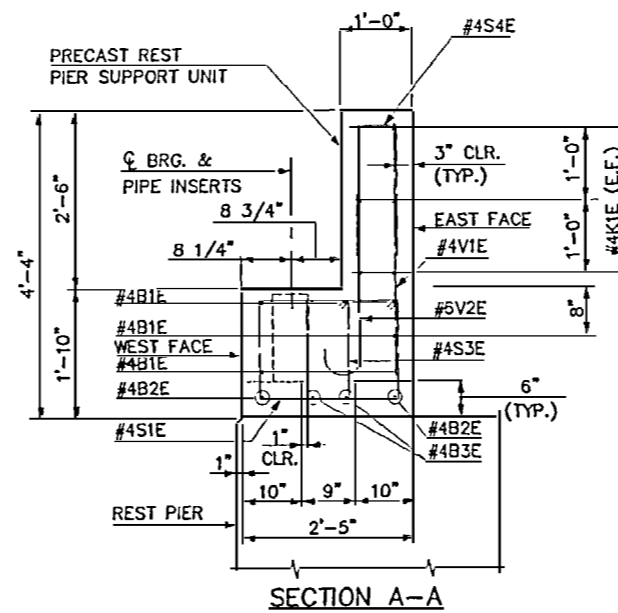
DETAILS OF ANCHORAGES @ WEST FACE OF REST PIER SUPPORT
